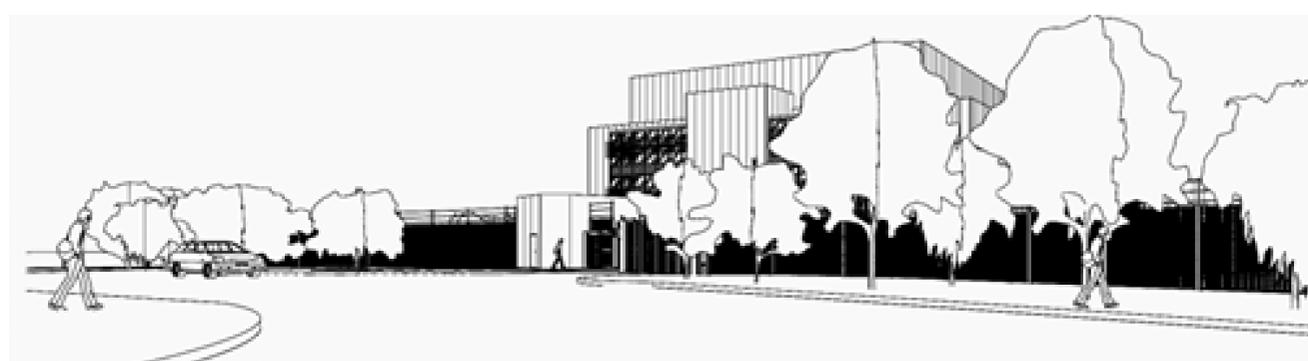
3D Sketch of illustrative design (view 2): Source: studioNWA Architects
